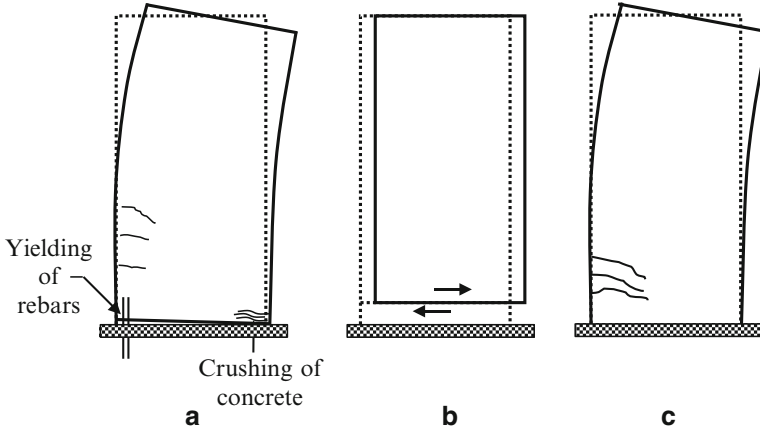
Typical failure modes of shear walls (a) Flexure failure, (b) Sliding failure, (c) Shear failure
